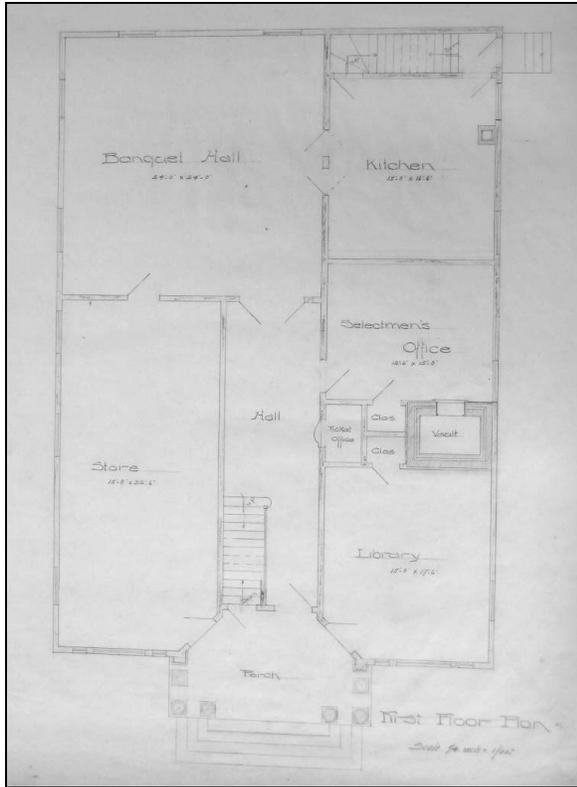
Proposed first-floor plan for Bath Town Hall, 1909-1910, with storefront. Collection of New Hampshire Historical Society.
